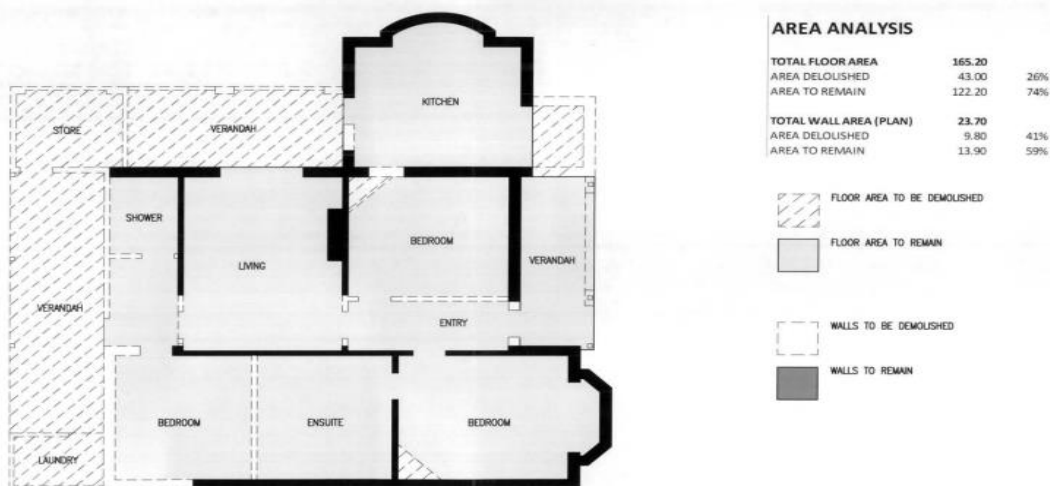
Existing floor plan prior to proposed alterations and additions to dwelling dated from 2014
